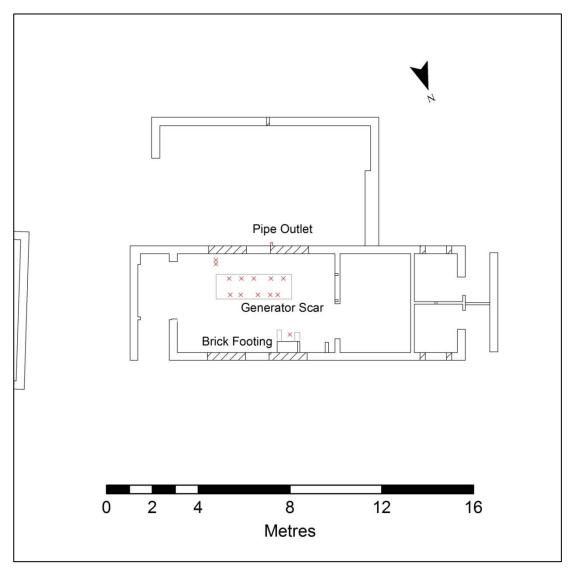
Station 53b's generator building at Godington. To limit the negative impact on the delicate equipment, the building was isolated from the transmitter building.⁵²
